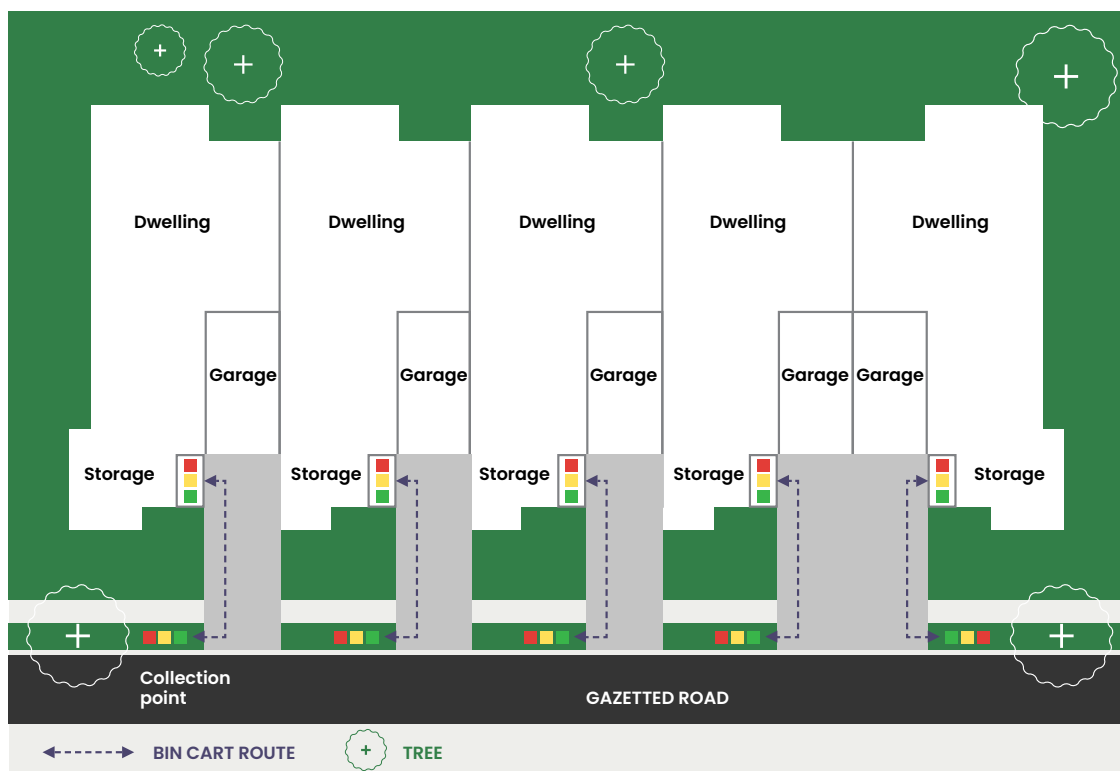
Waste storage area and kerbside waste collection point for multi-dwelling housing.
